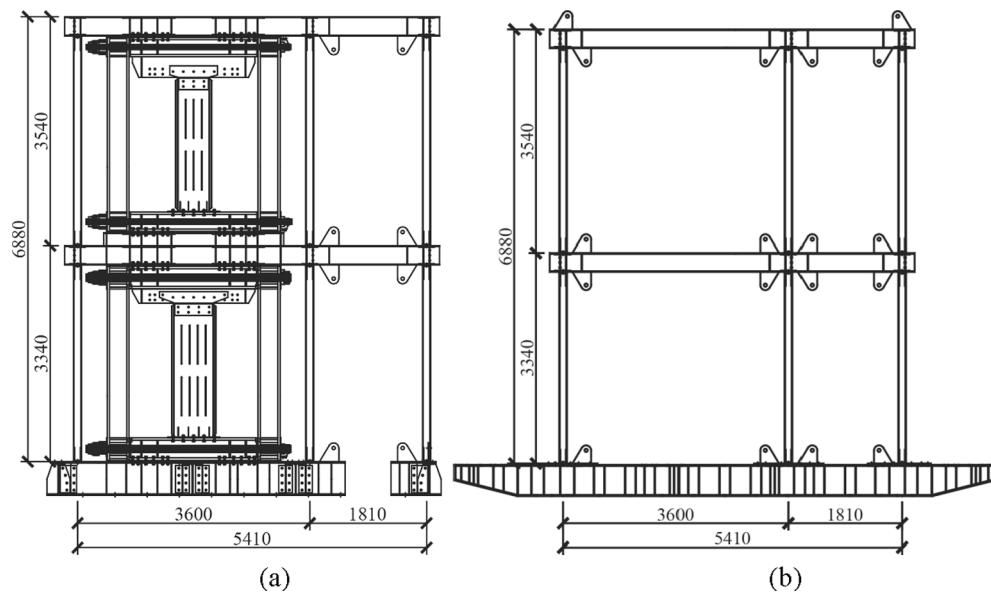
Elevation view of the test structure in the X direction: (a) interior frame equipped with SCMPs; (b) bare exterior frames.
